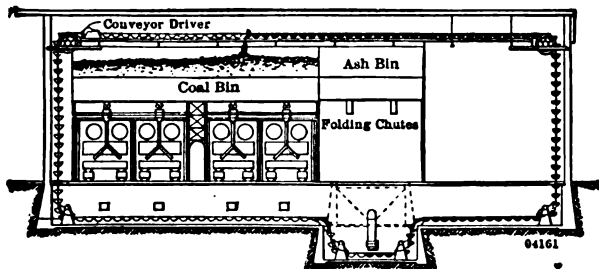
SECTION THROUGH A POWER PLANT EQUIPPED WITH HUNT PIVOTED BUCKET CONVEYOR
